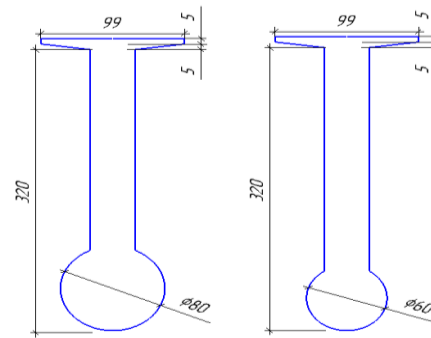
Geometric dimensions of models of pile foundations with a broadened sphere and a conical head in section.
